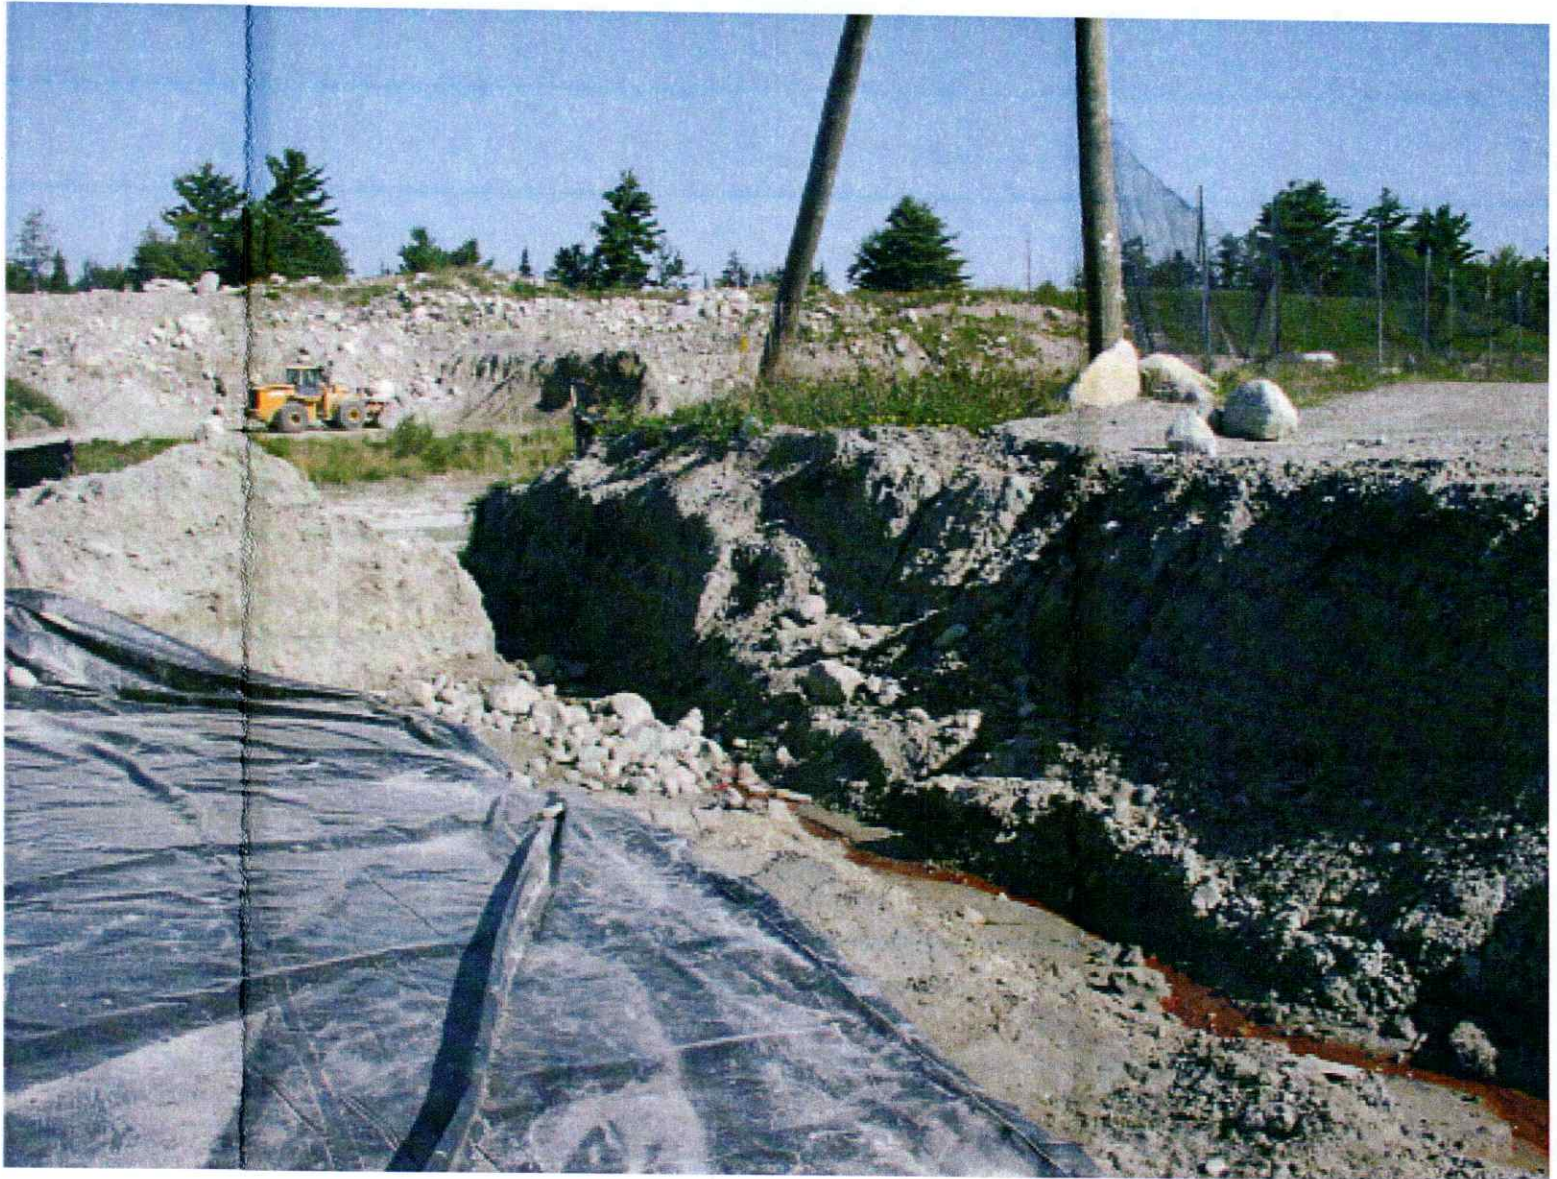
This picture is looking north towards MW 913M. The open trench is where the 36" culvert connecting the Stage 1 Phase 1 down chute to detention pond 3 was located.
